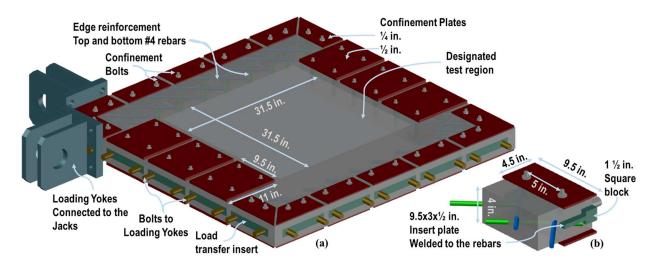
UHPC Panel details: (a) Full panel details; (b) Enlarged insert details.
